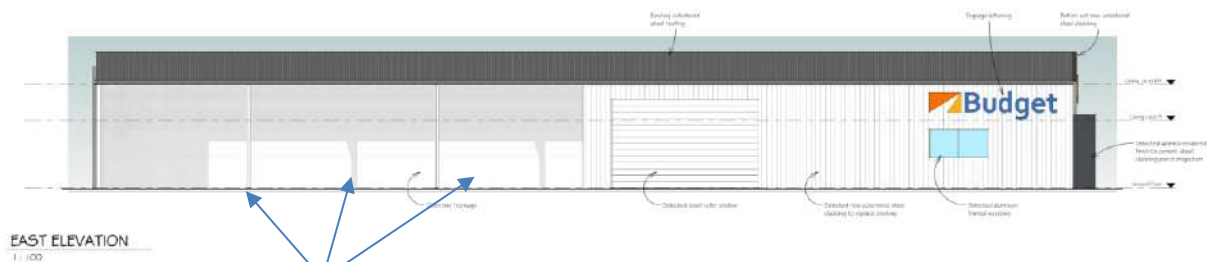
x3 wall panels removed from Warehouse 2 (Source Concept Drawings)
